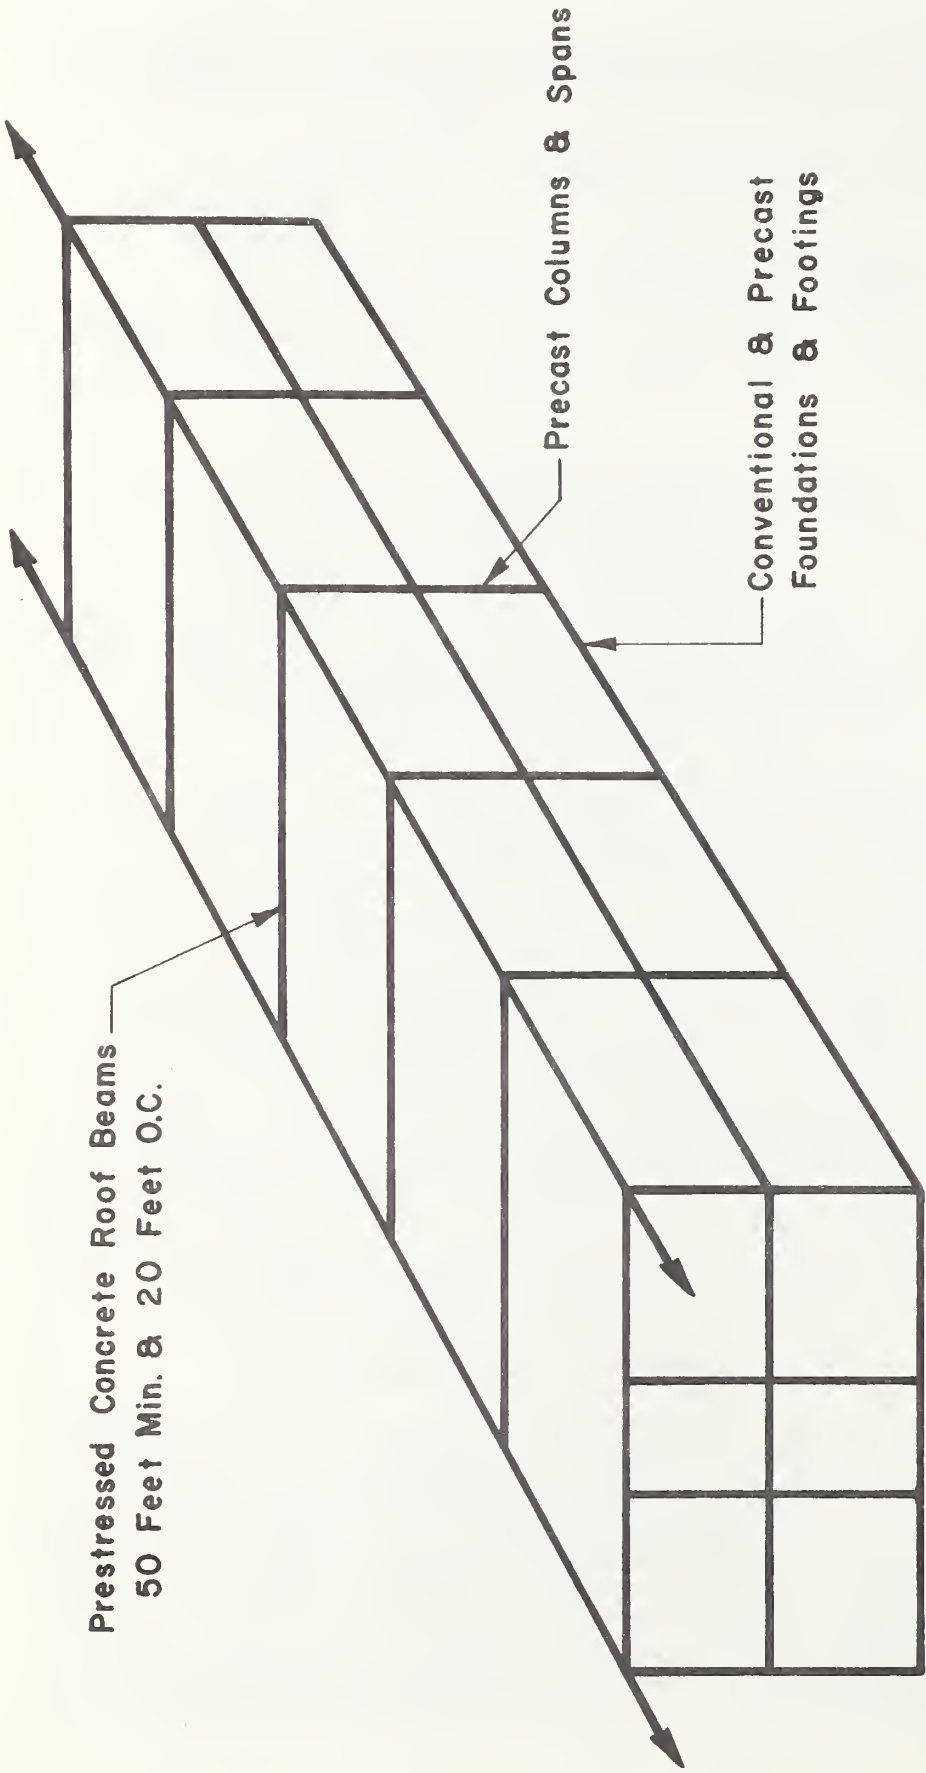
STRUCTURAL FRAME, FOUNDATION, AND FOOTING SYSTEM
